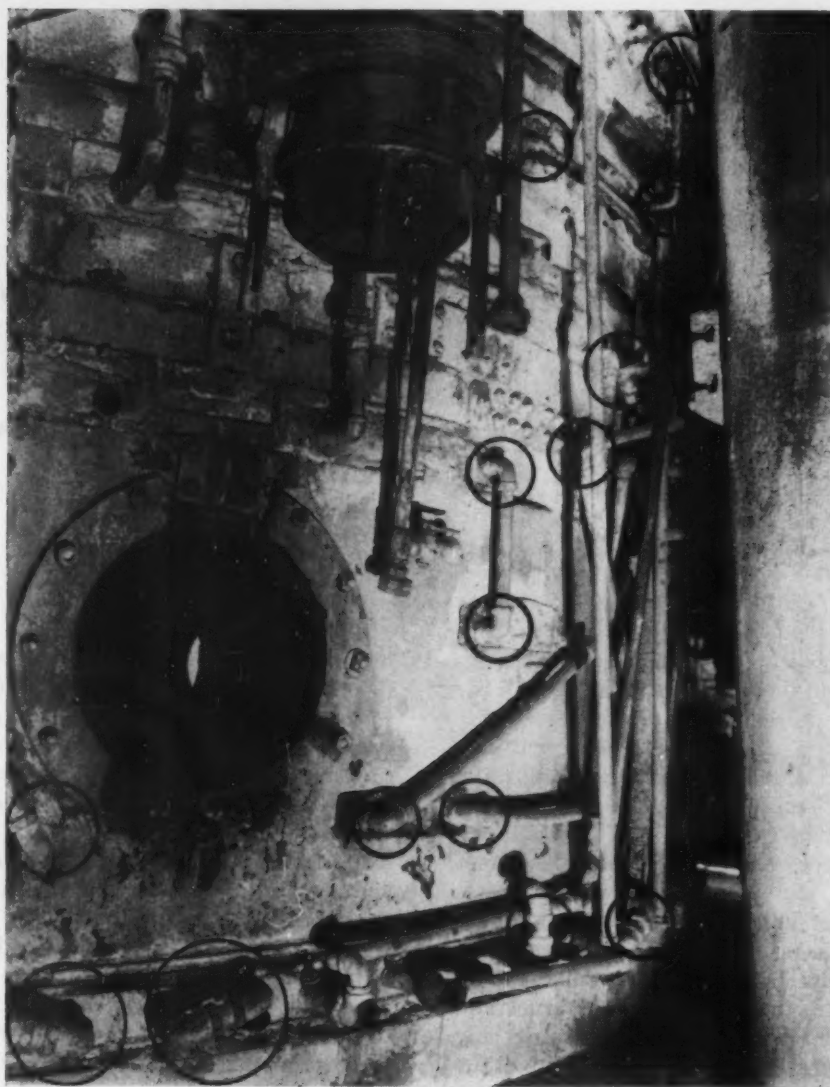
Photograph taken after furnace shutdown showing location of some of the fittings; about six hundred were used for the complete job.
